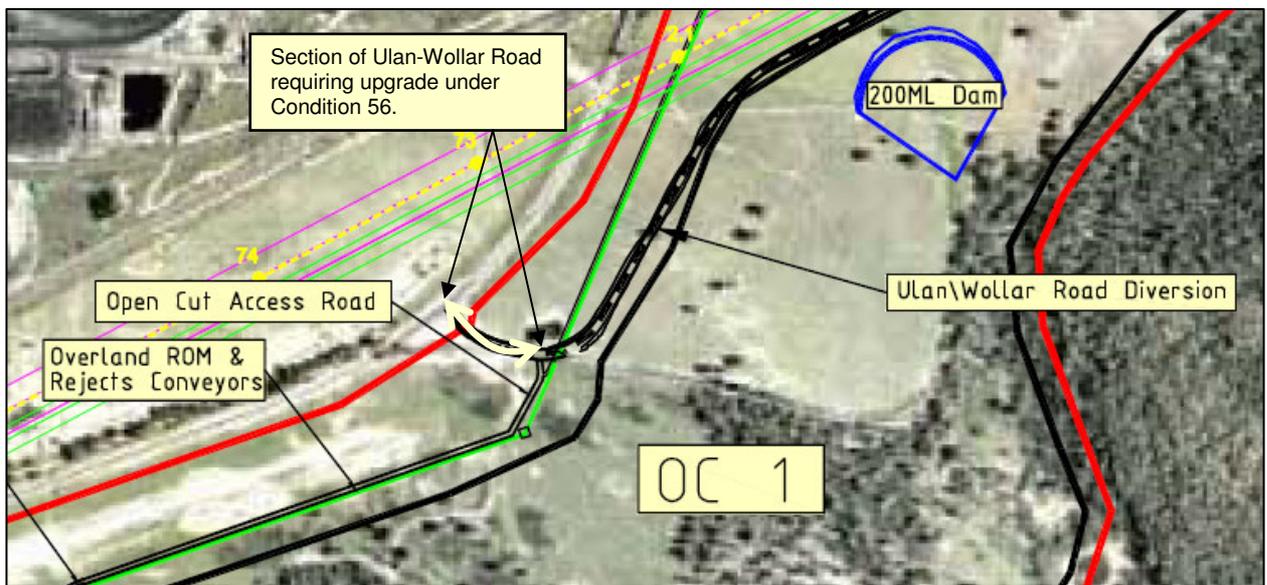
Section of Ulan-Wollar Road required to be upgraded under Condition 56
